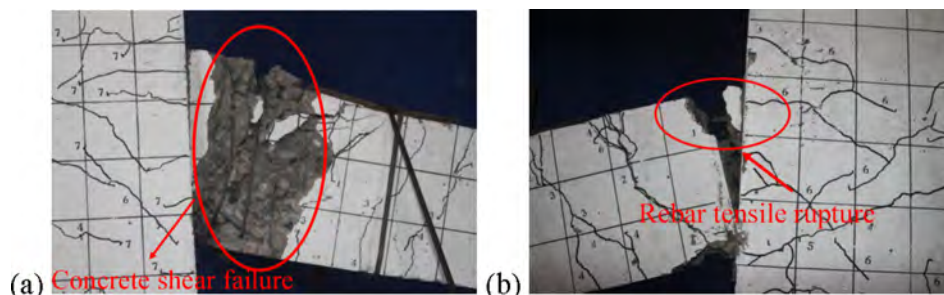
Crack distribution of RC specimen after 20 min of the test: (a) interior beam-column joint; (b) right exterior beam-column joint.
